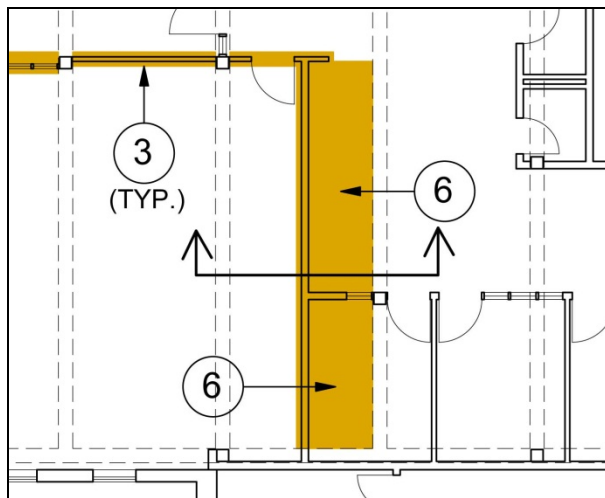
Partial plan showing remaining portion of Tectum form plank span to be removed above suspended ceiling at corridor and small office space (Note 6). See Figure G-30 for section drawing indicated on plan.
